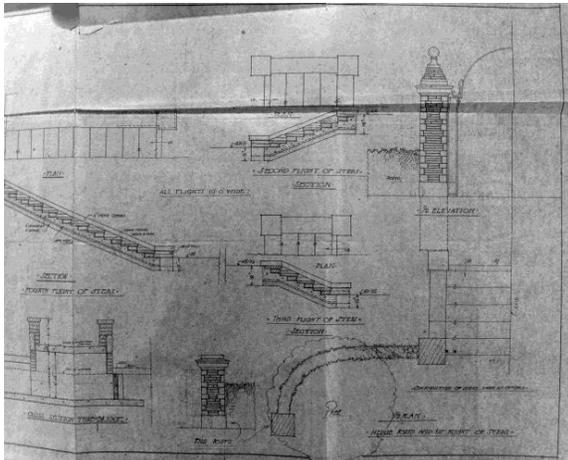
Wall Design, School of Landscape Architecture Archives, University of Guelph
